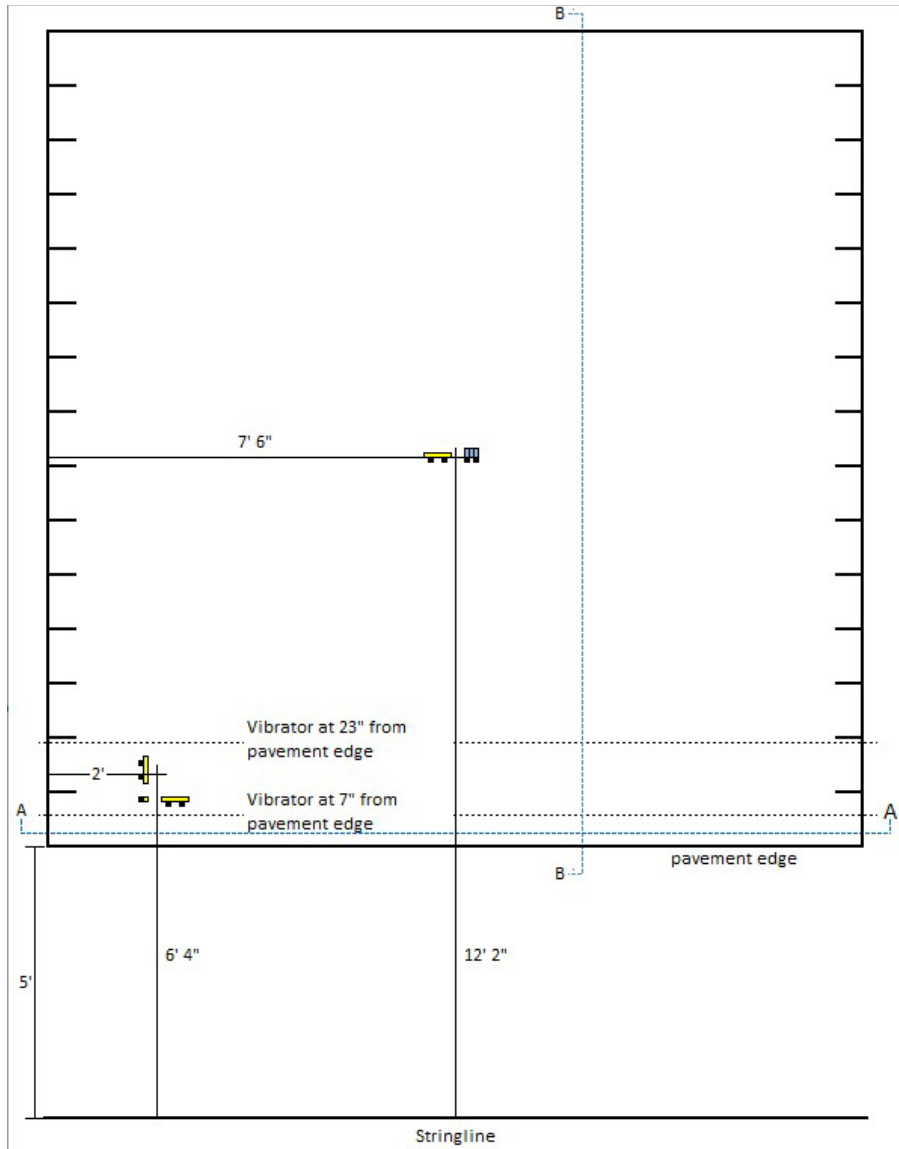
Plan View of Single Instrumented Panel with Gage Location (Not to Scale)
